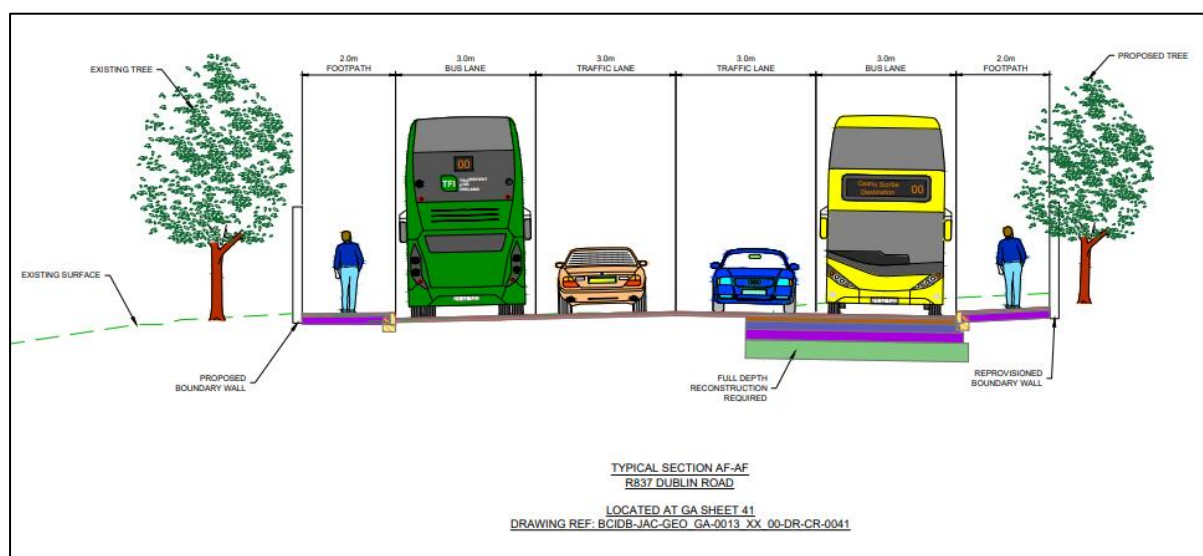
Extract from Typical Cross Section AF-AF on Dublin Road, near Woodbank Estate (Sheet 18)
